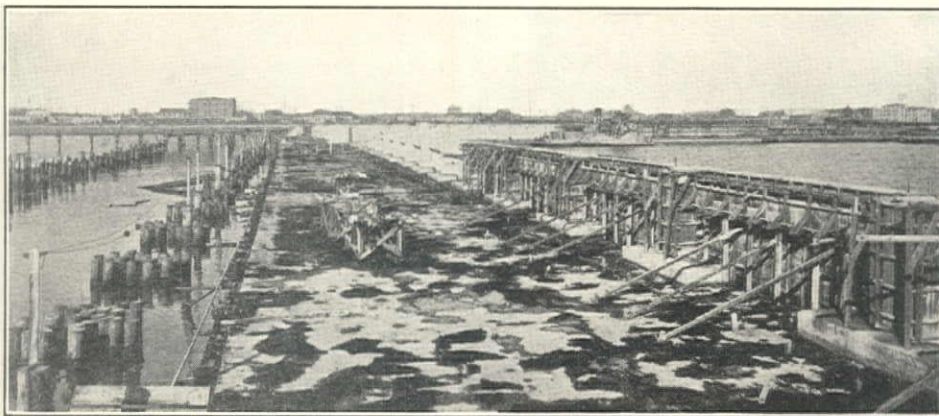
REINFORCED CONCRETE RELIEVING PLATFORM AND RETAINING WALL, LONG BEACH OUTER HARBOR
